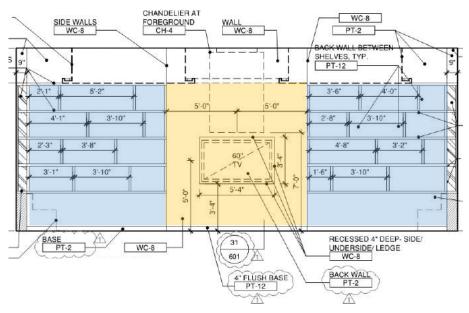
| Ground Floor Interior Elevation - Entertainment Lounge
